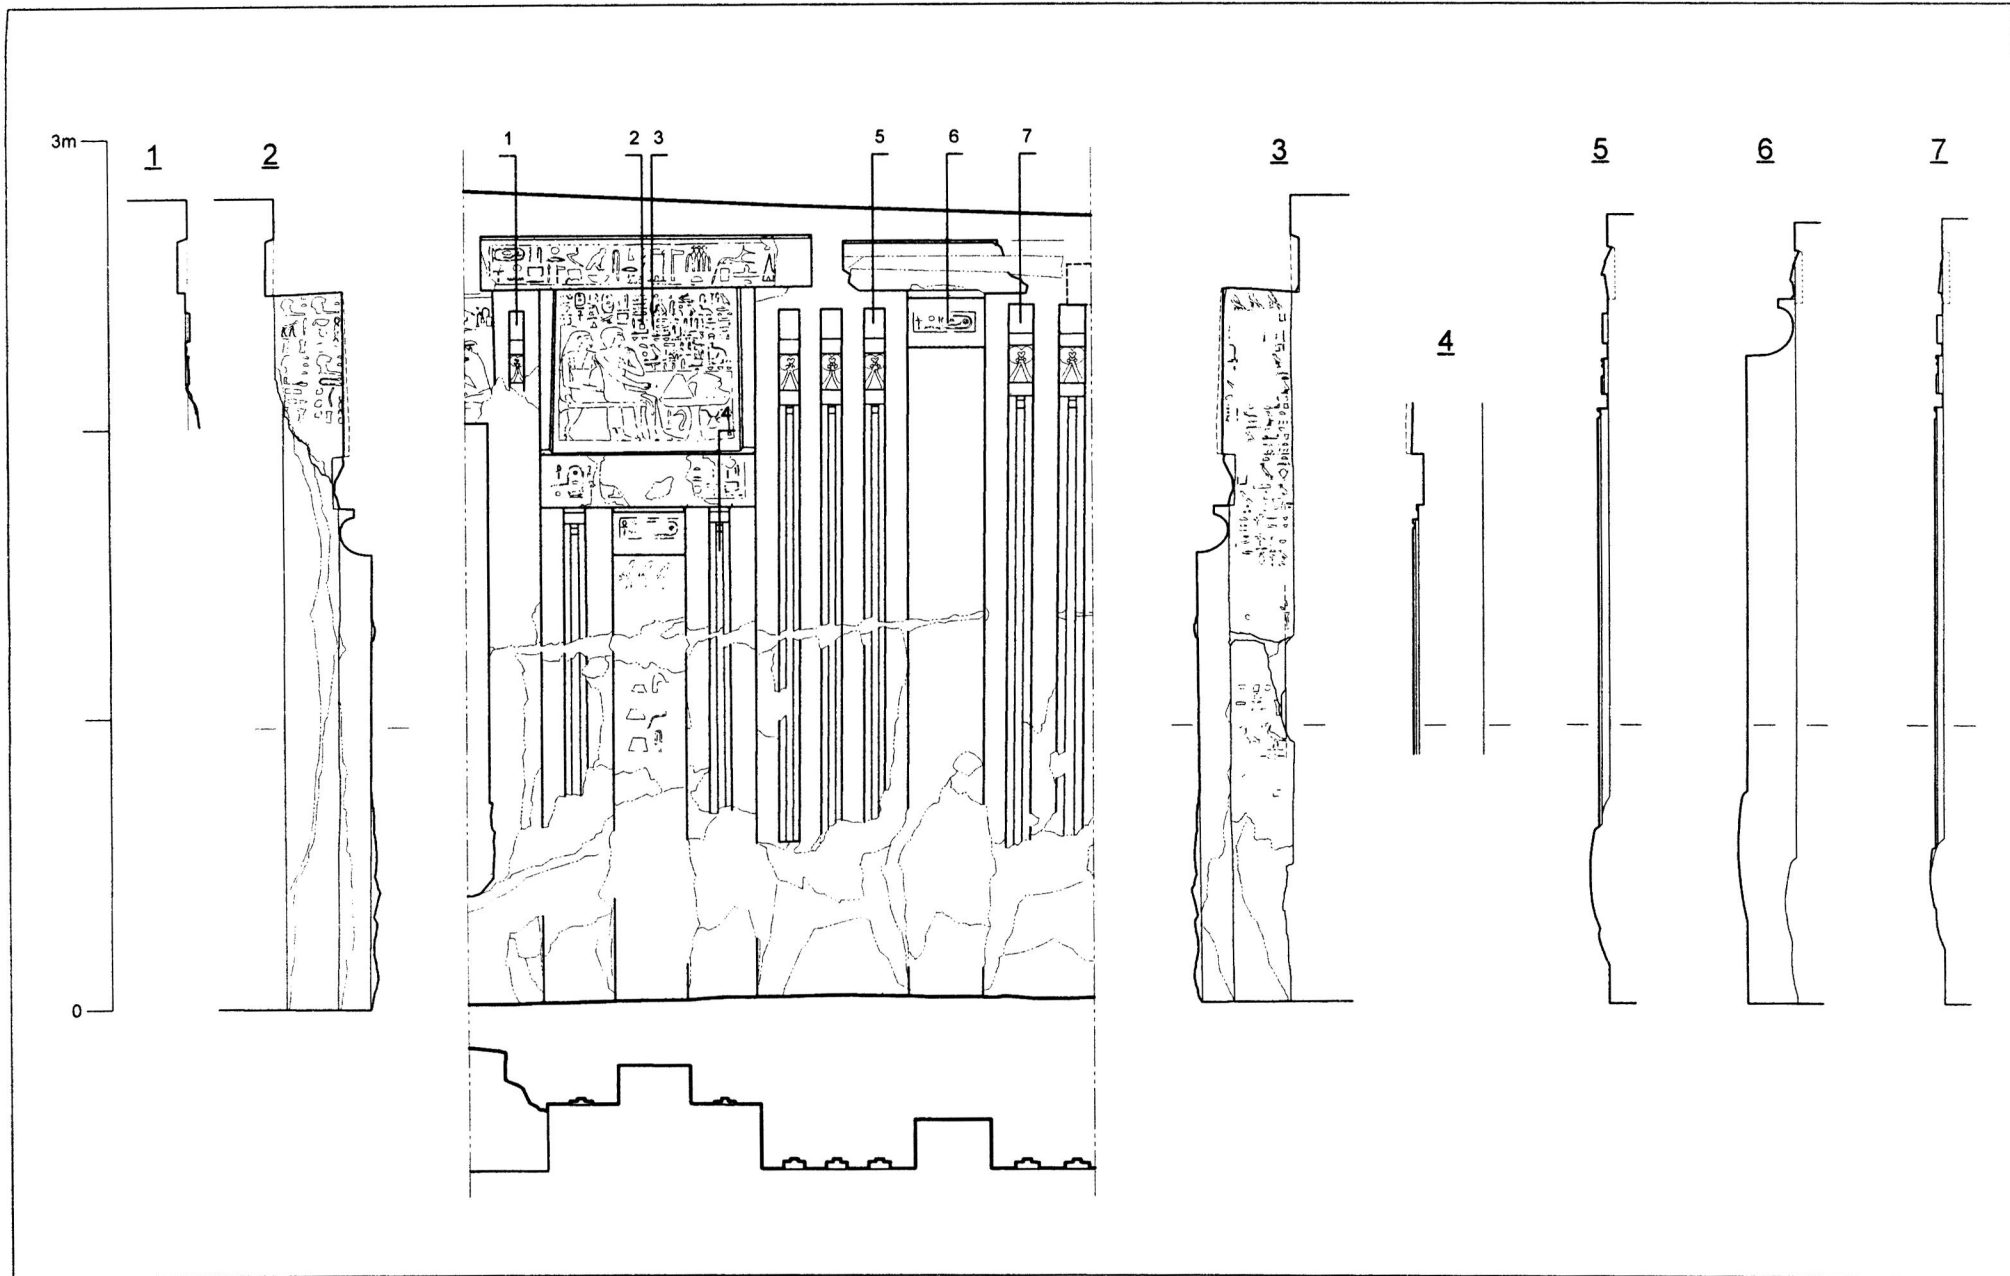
Tomb of Khafraankh. Western wall, left part, sections and plan
